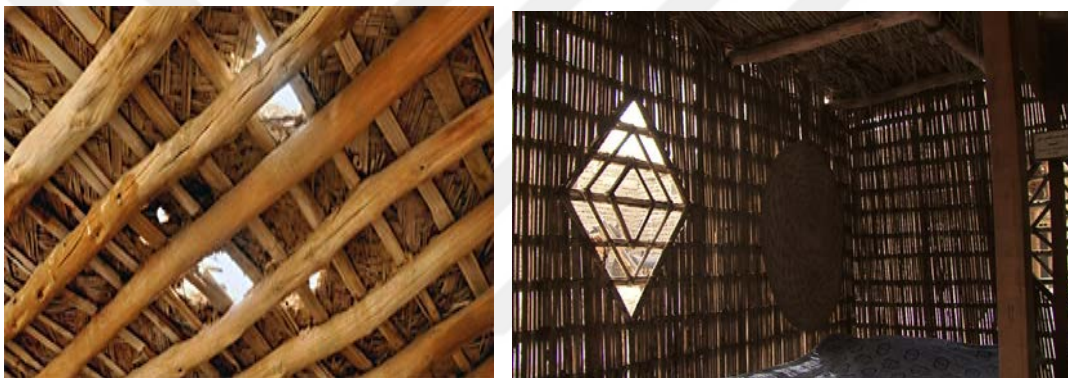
shows woven ceiling panels of palm frond lashed with mangrove beams (left) (Source: Lockerbie, 2021) and (right) show the spacing of the palm frond walls to provide for light and ventilation in the interior space. (Source: shutterstock,2021)
